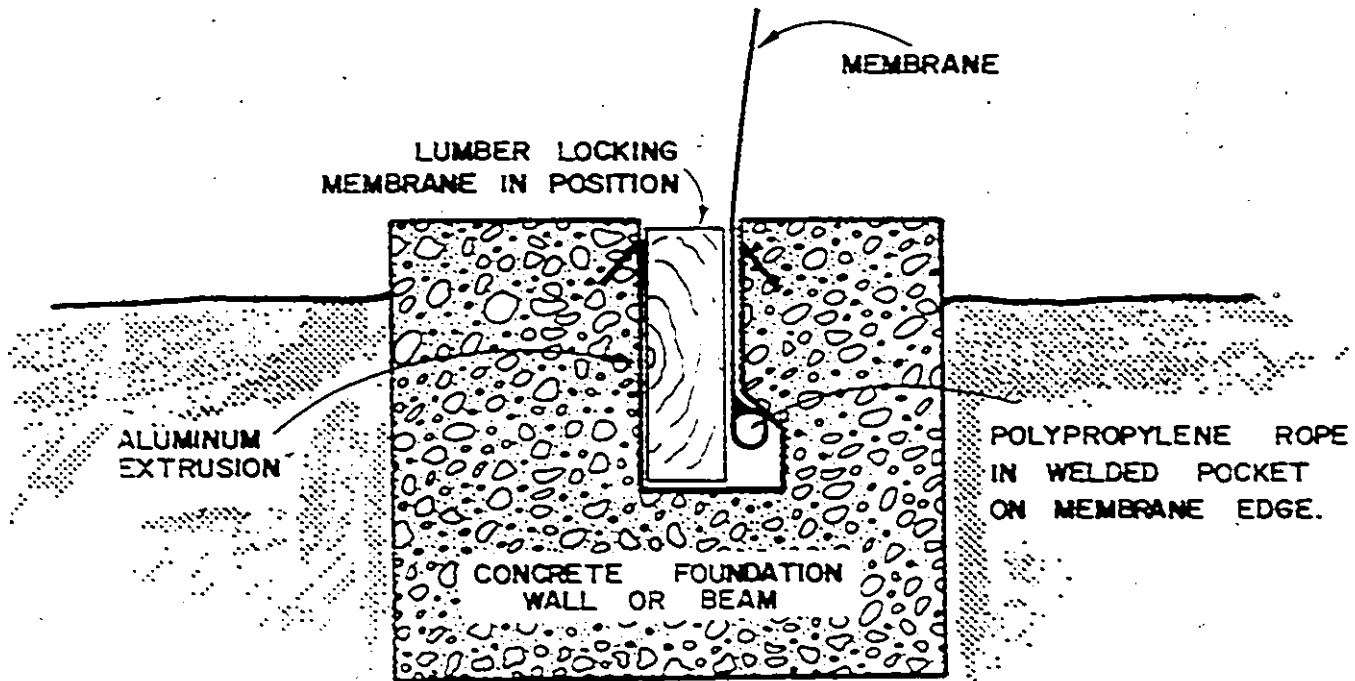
(ii) SECTION THROUGH CONTINUOUS ANCHOR SYSTEM.
